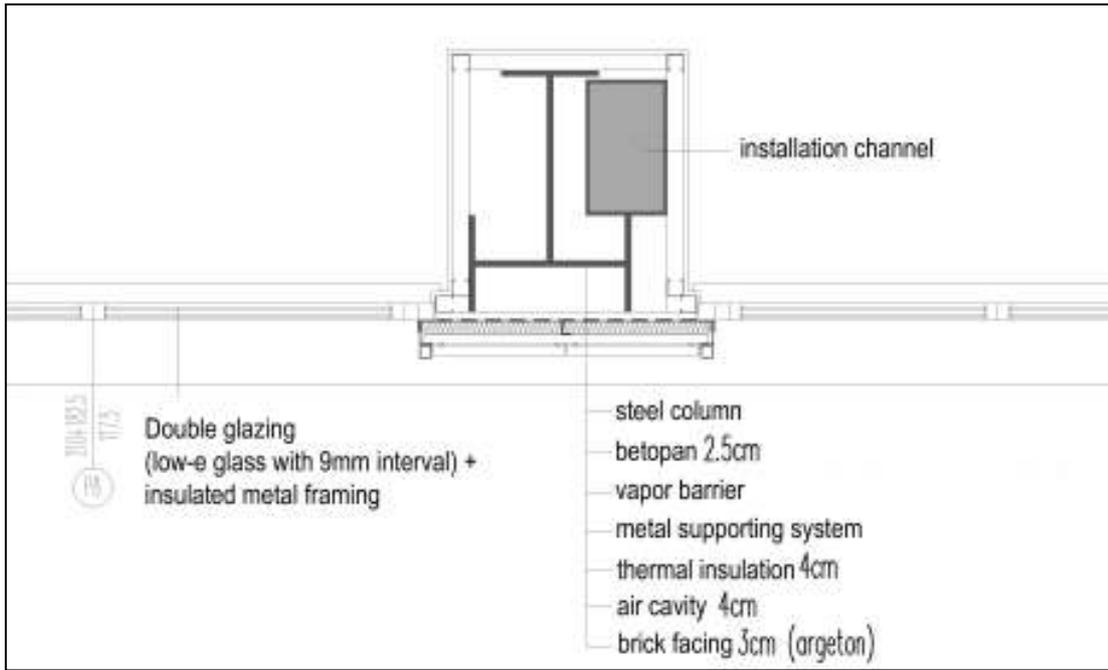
A detail showing the installation channel adjacent to the steel column
